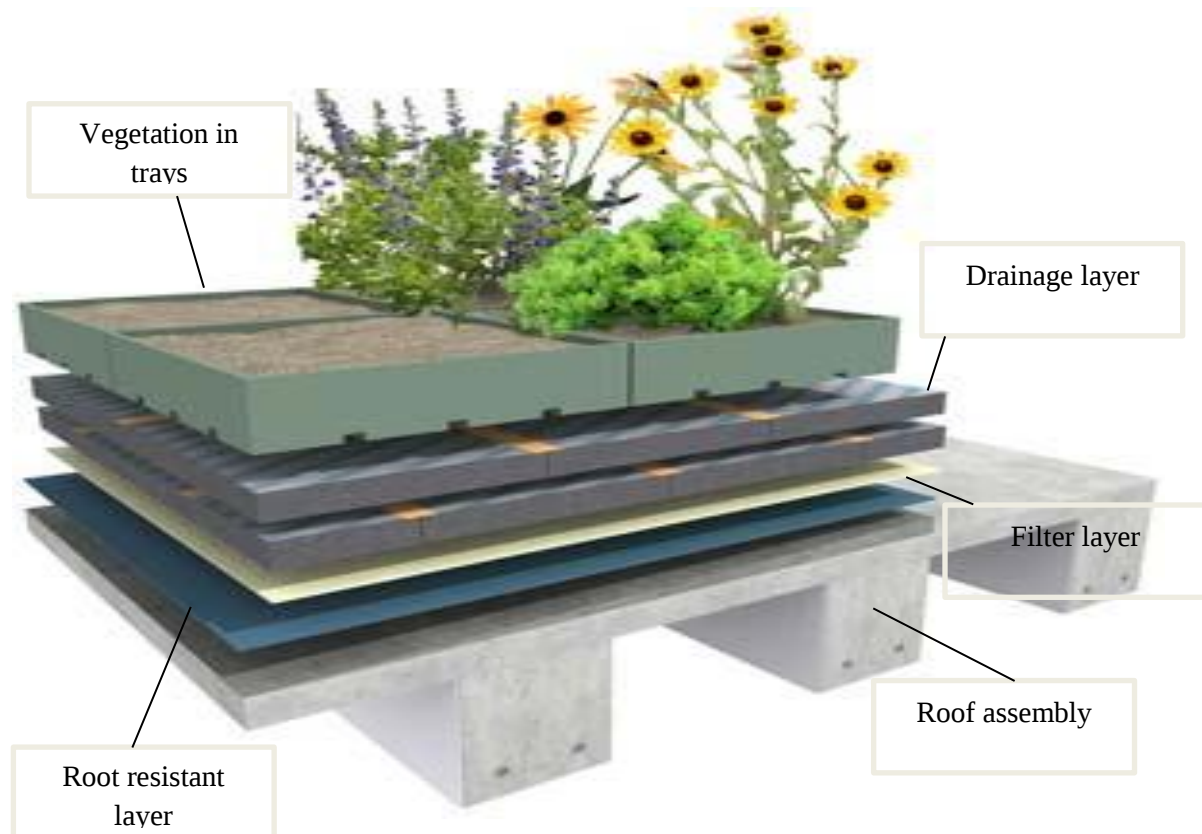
Modular green roof planting (Adapted from UK Urban Development Services, 2008).
